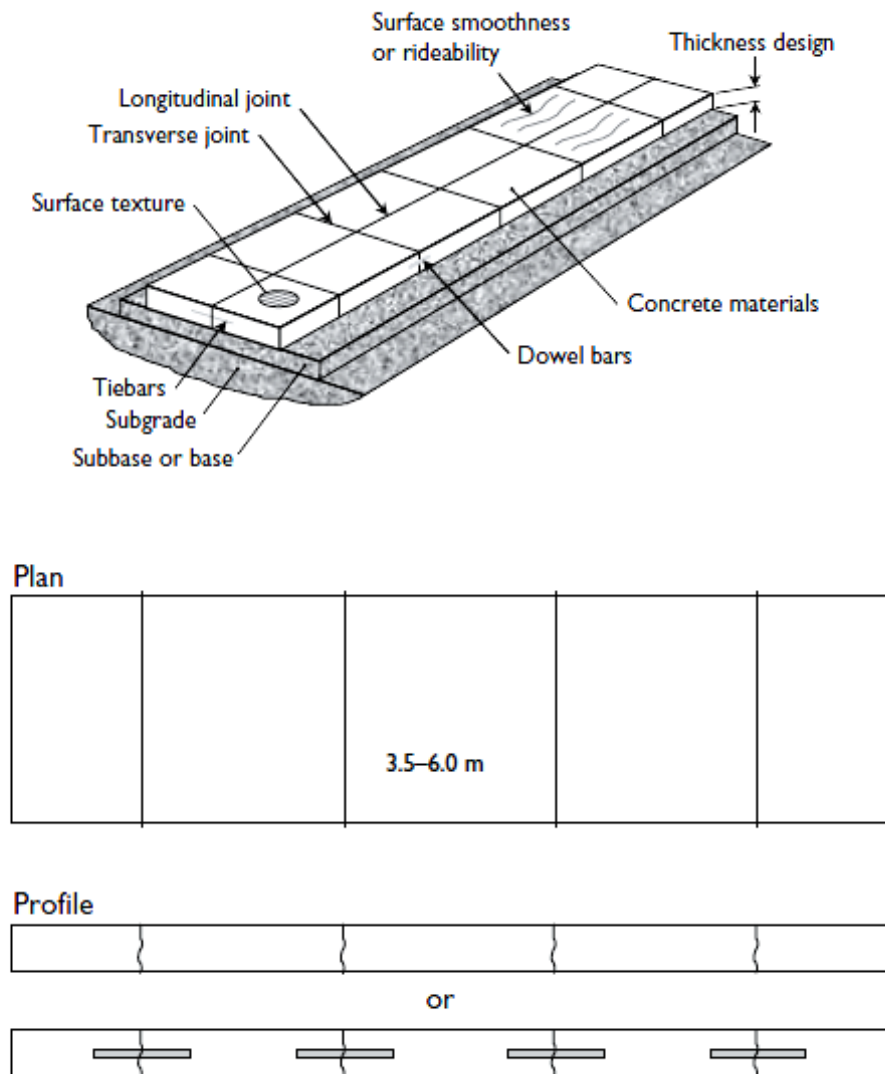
Jointed Plain Concrete Pavement (JPCP).
